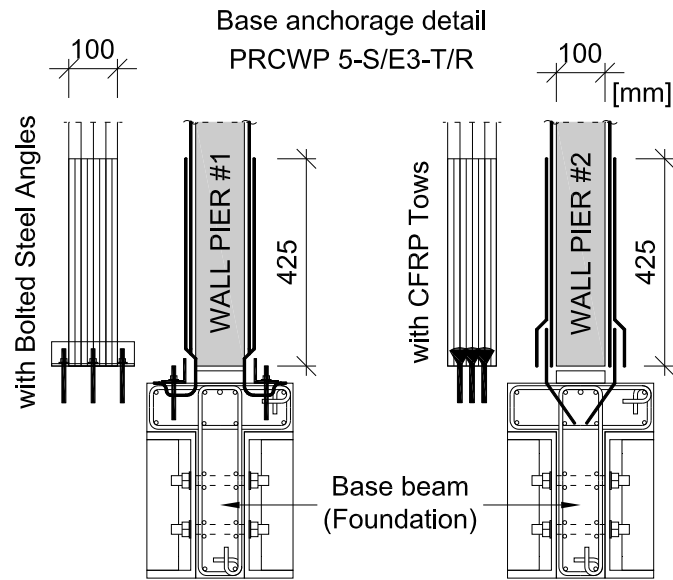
FRP layout detail at the base anchorage of PRCWP 5-S/E3-T/R
